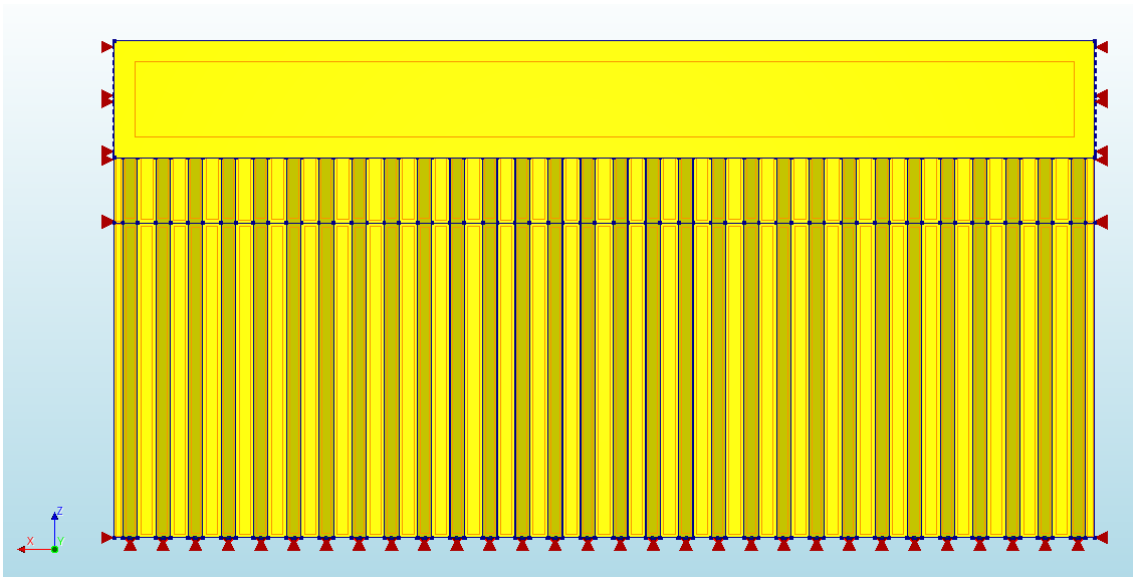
Sheet pile wall and capping beam structure viewed from land side, with boundary conditions on the sheet piles displayed. Load application from soil pressure shown as orange lines applied in plane.
